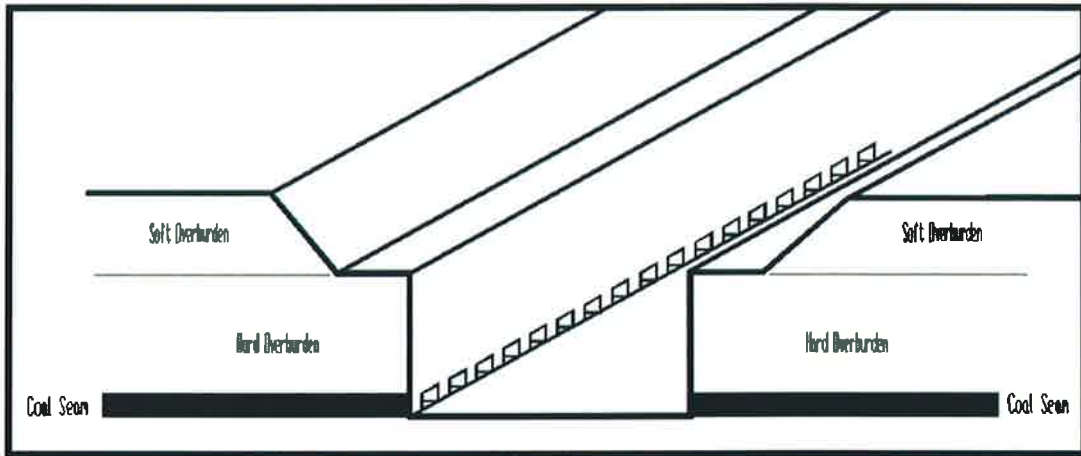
Typical cross section of boxcut pit and high wall mining holes
